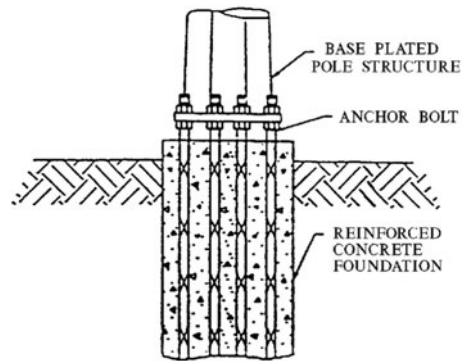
Drilled Shaft Foundation with Anchor Bolts.
